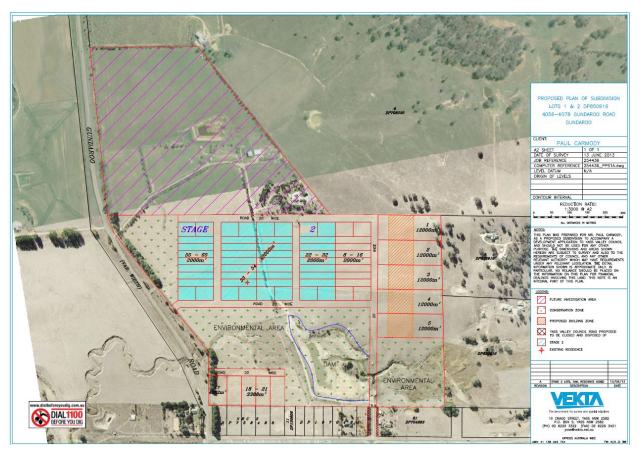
Proposed Kyeema Lot Layout (VETKA, 2013)
